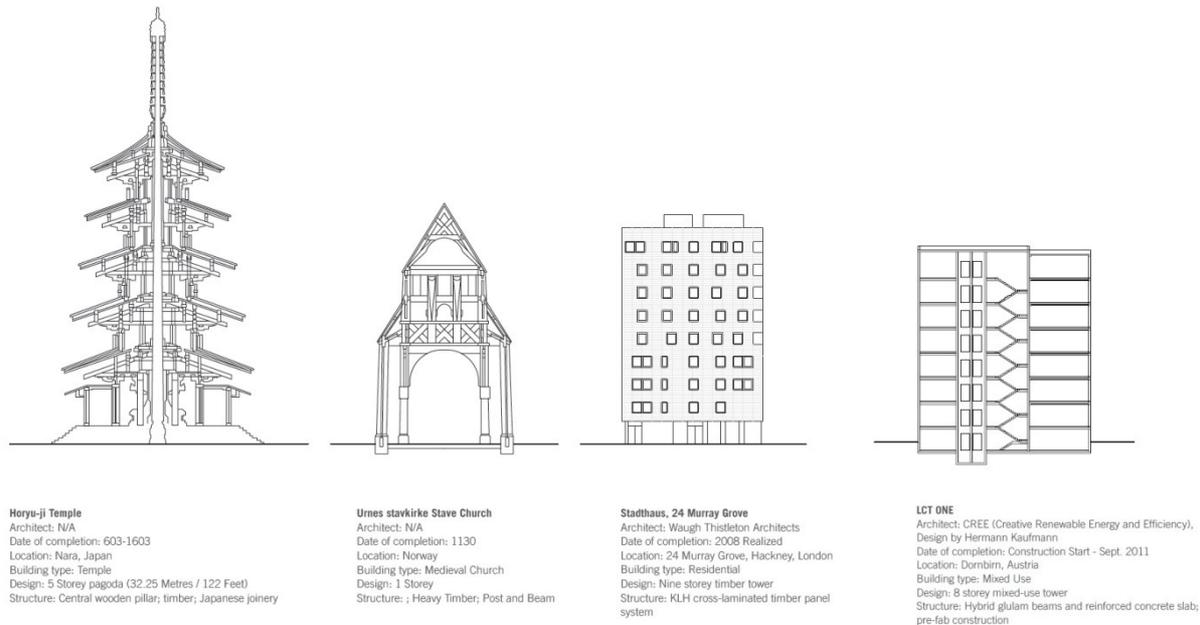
the tallest and oldest wooden building elevations,as well as for newest woden buildings (internet source- <http://cwc.ca/wp-content/uploads/publications-Tall-Wood.pdf>)
